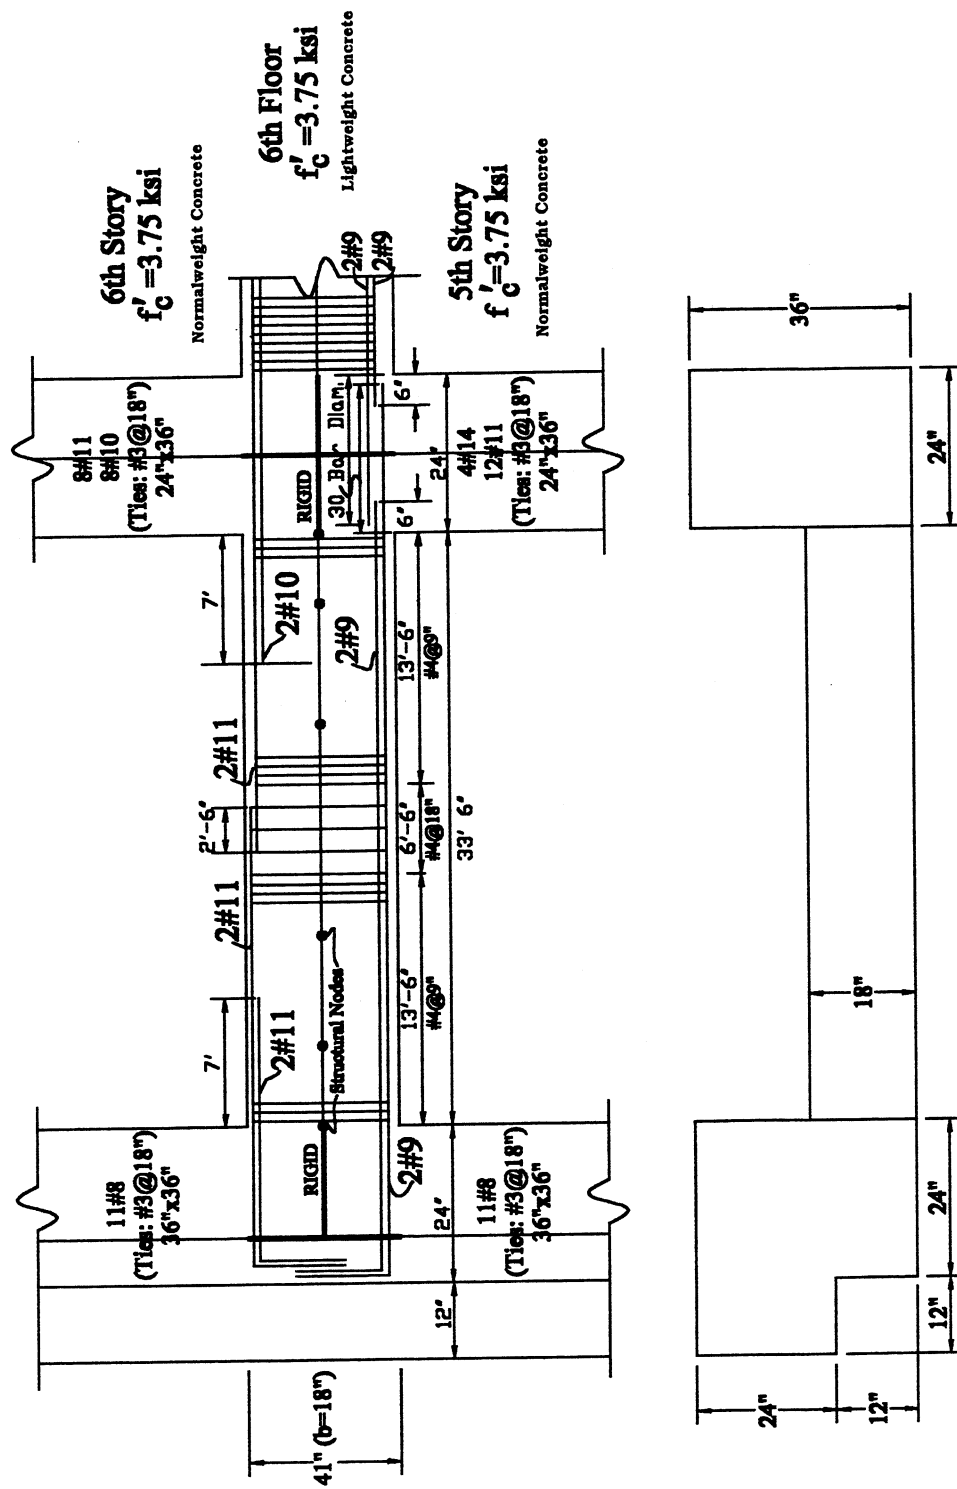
Reinforcement details for the 6<sup>th</sup> to 8<sup>th</sup> floor beams of exterior transverse frames.
